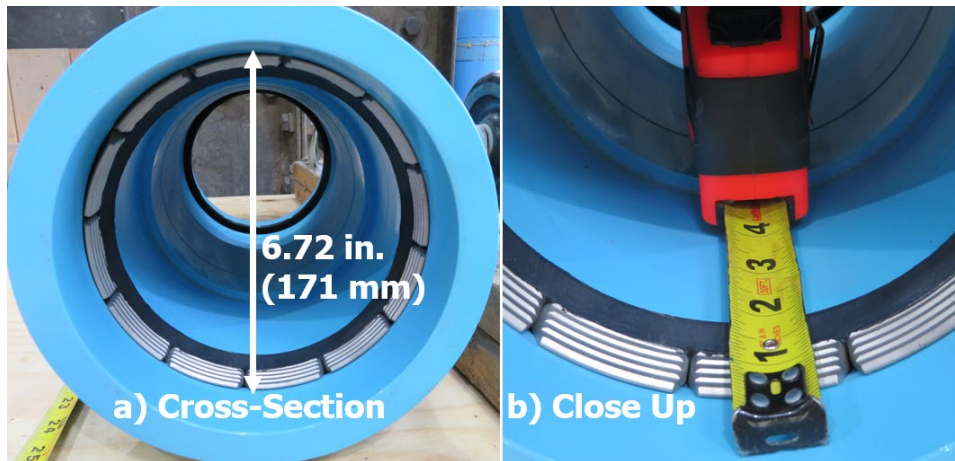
Transverse Cross-Section of iPVC™ Fitting
